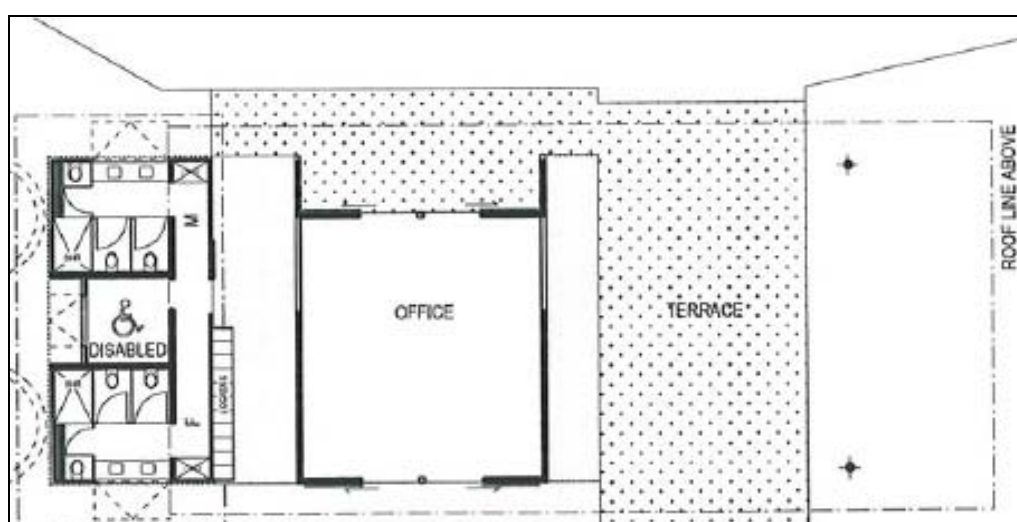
Gatehouse Building Floor Plan (source: Environmental Assessment)
